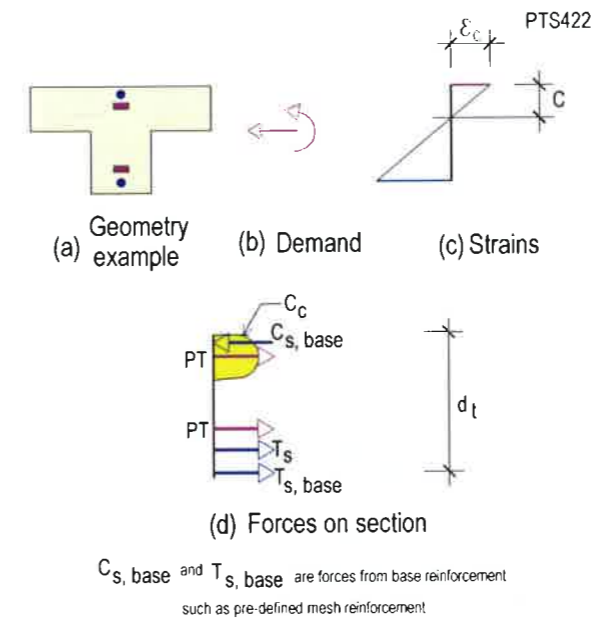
C-1 Design Section Geometry, Reinforcement, Strains and Forces
